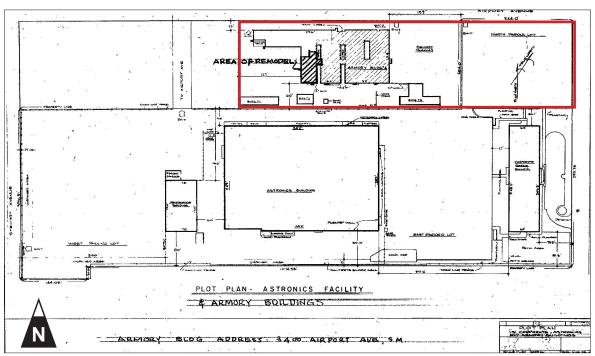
Site plan for Lear Siegler Astronics Facility and 3400 Airport Avenue outlined in red (City of Santa Monica, Building Permit, 1983).
